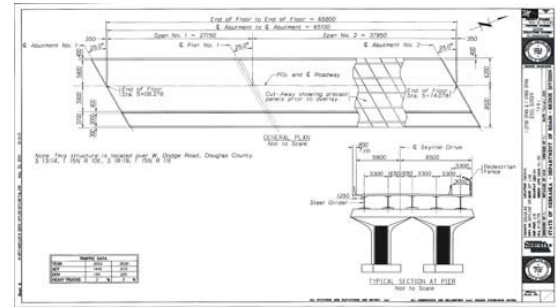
Elevation & Plan Views of the Skyline Dr. Bridge
